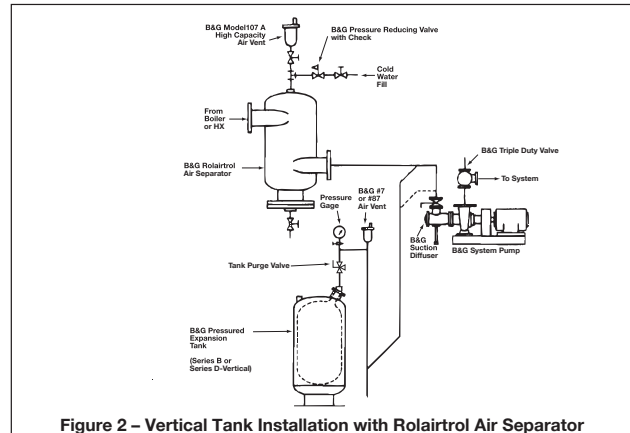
Vertical Tank Installation with Rolairtrol Air Separator
